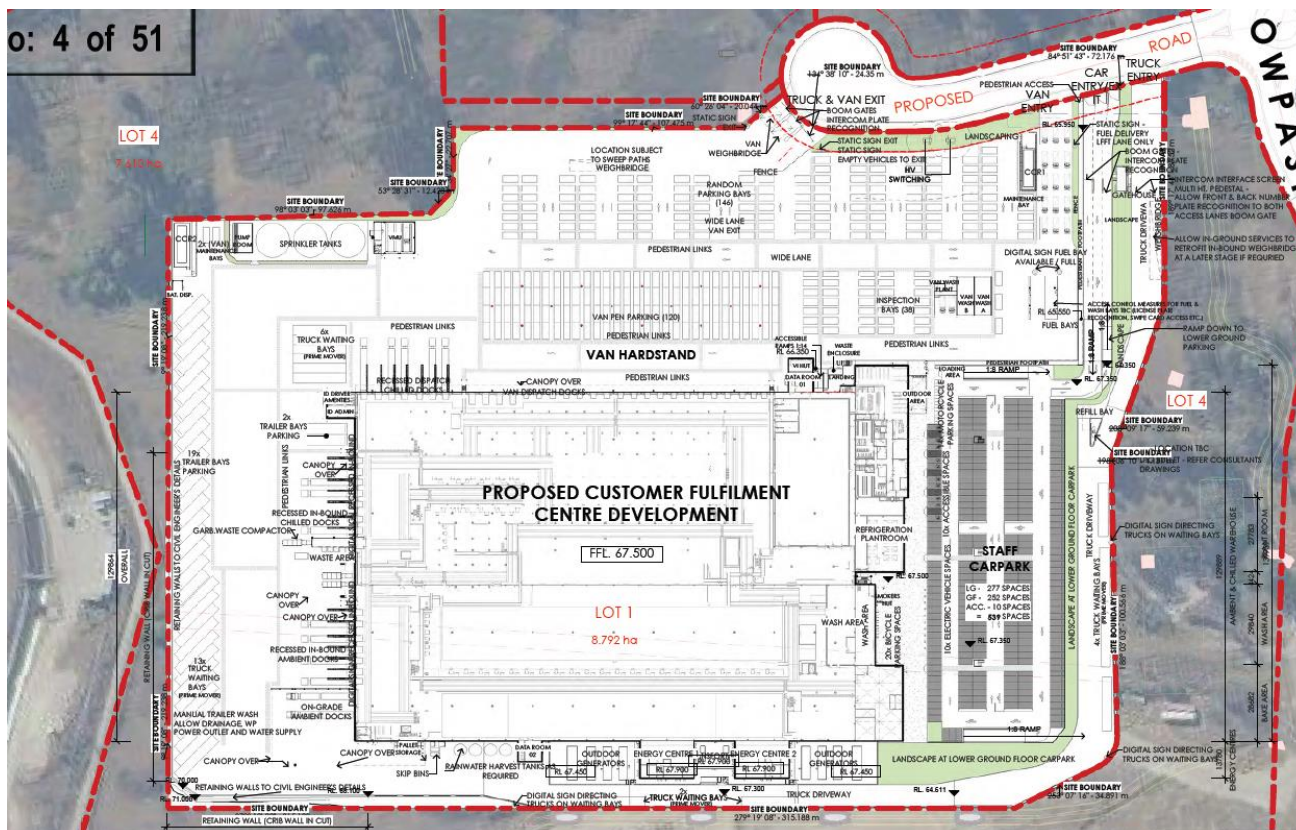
Approved Overall Site Plan DA020 Rev H (SSD 10404)
